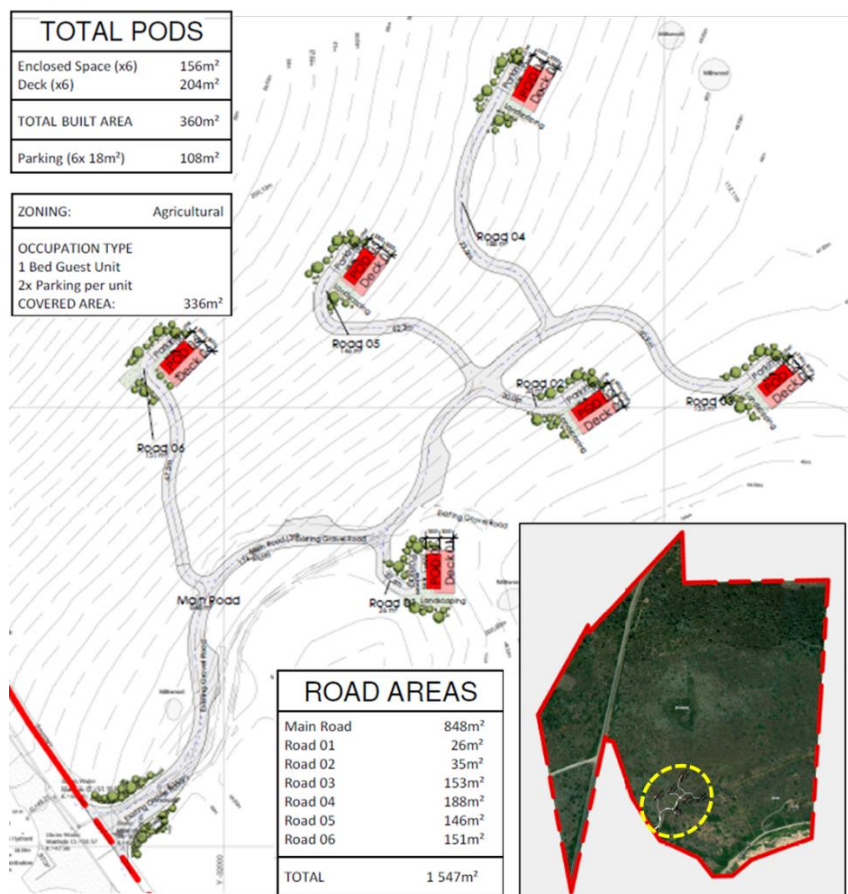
The site development plan (SDP) on a section of the property (outlined area in yellow dotted outline).
